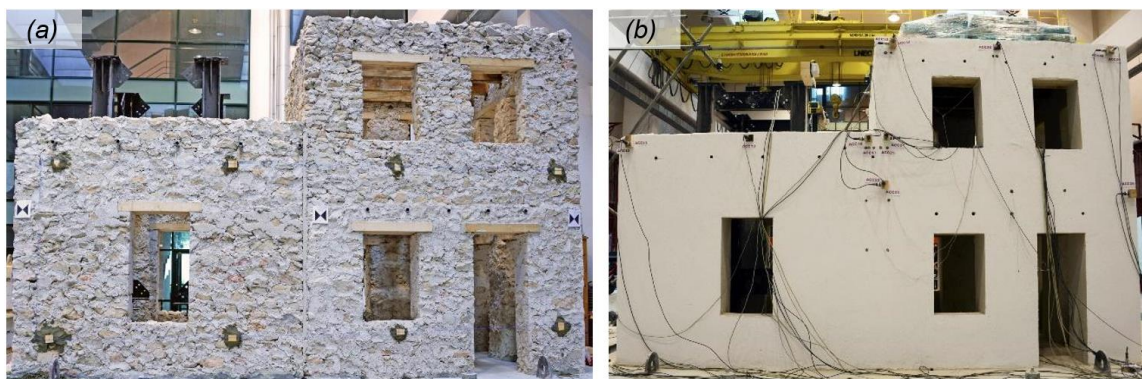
SERA AIMS specimen: a) before plastering; b) after plastering [3]
